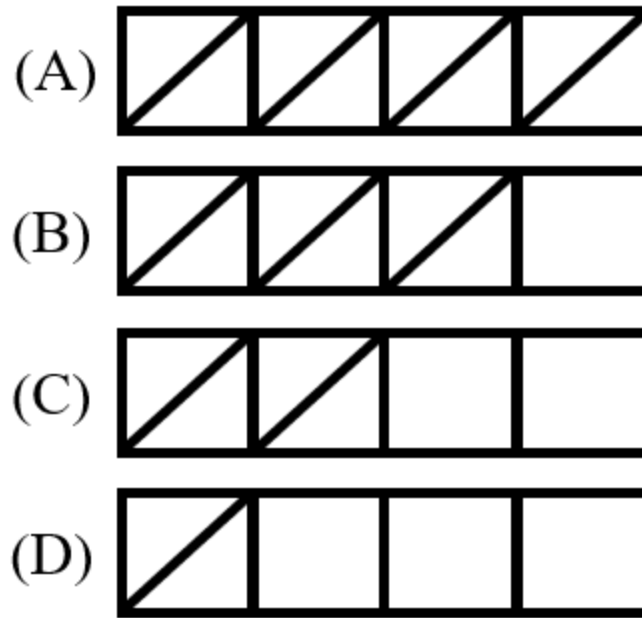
Cross-Frames Exterior Aligned Configurations for Five Girders
